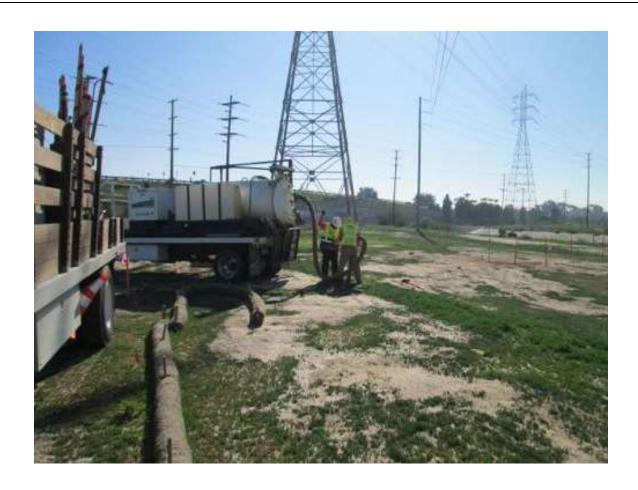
Potholing activities were conducted within the Bay Boulevard substation footprint. Crews were observed working with straw wattles installed around equipment and drip pans were observed placed under vehicles to contain any potential leaks accordance with the project SWPPP.
